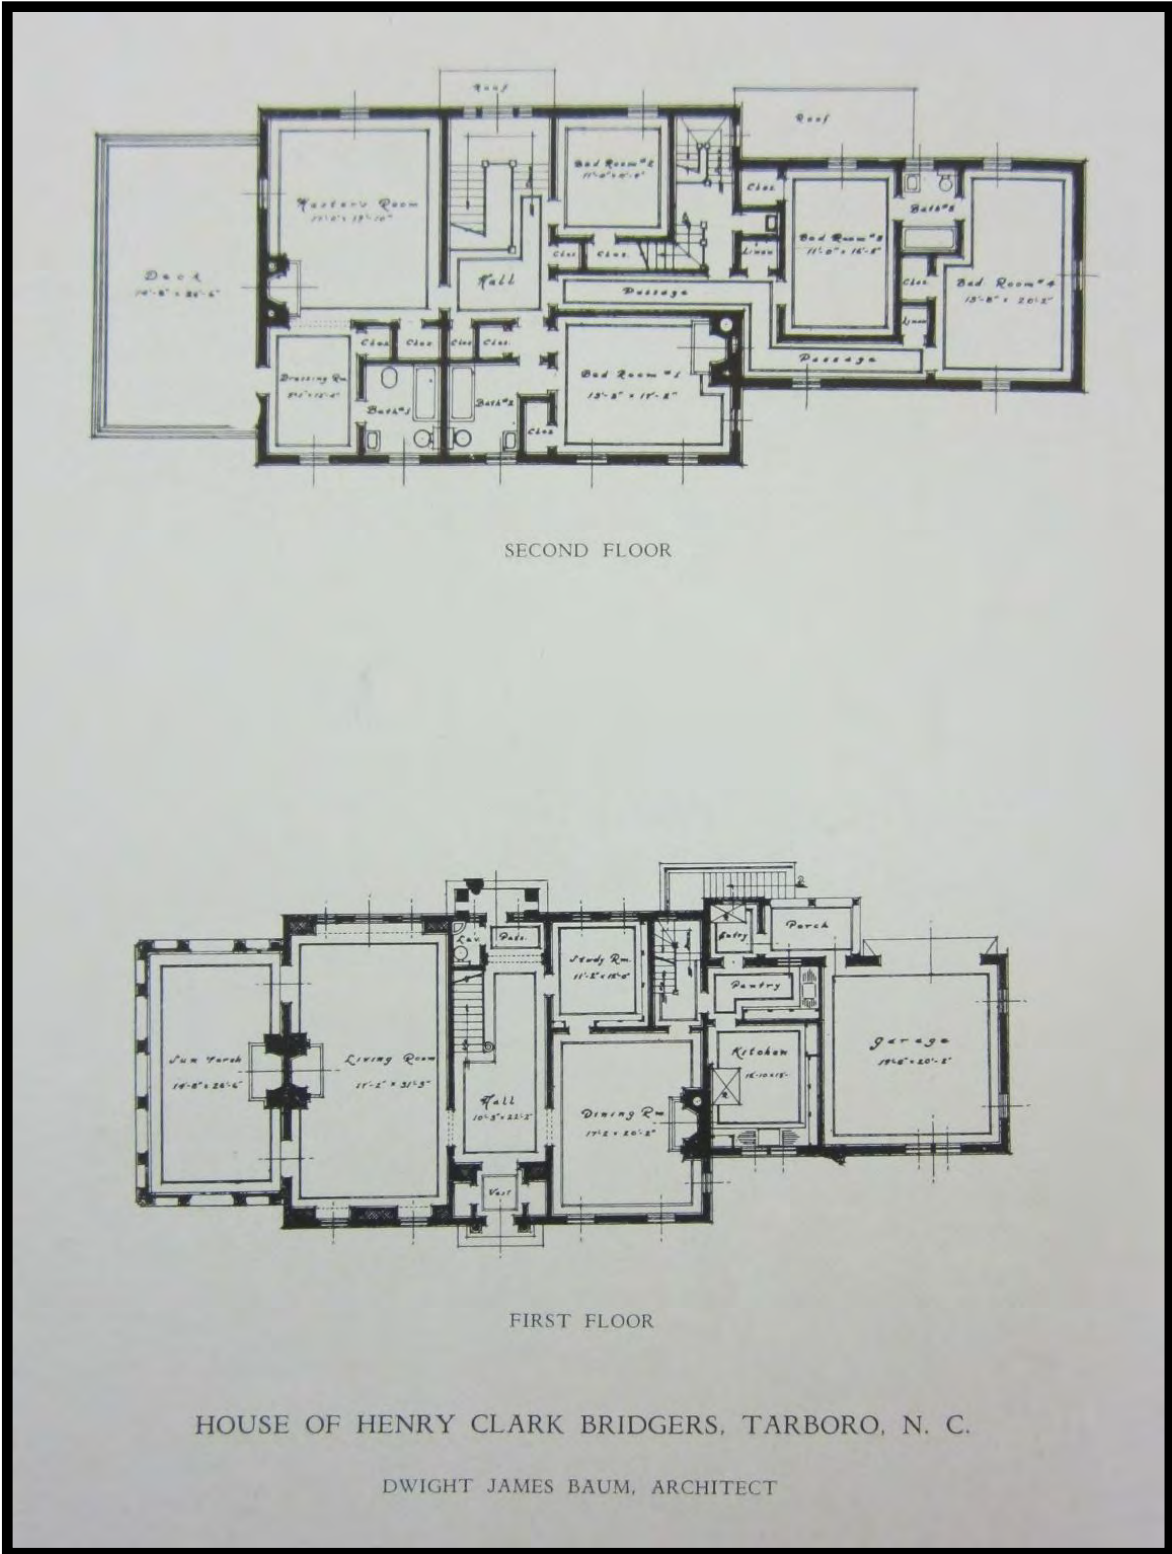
First and Second Floor Plans of the “House of Henry Clark Bridgers, Tarboro, N.C.” *Southern Architect and Building News*, May 1931 (Harman Publishing Co.: Atlanta, GA).
